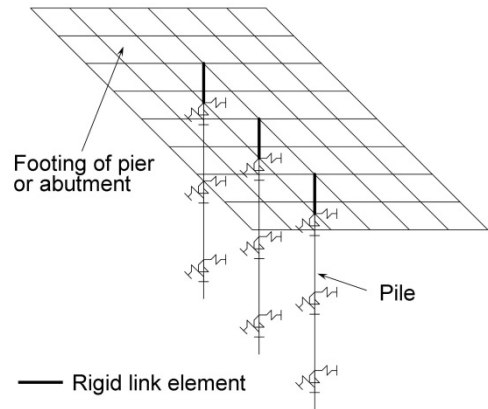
Modeling of connection between piles and footing of abutment or pier
